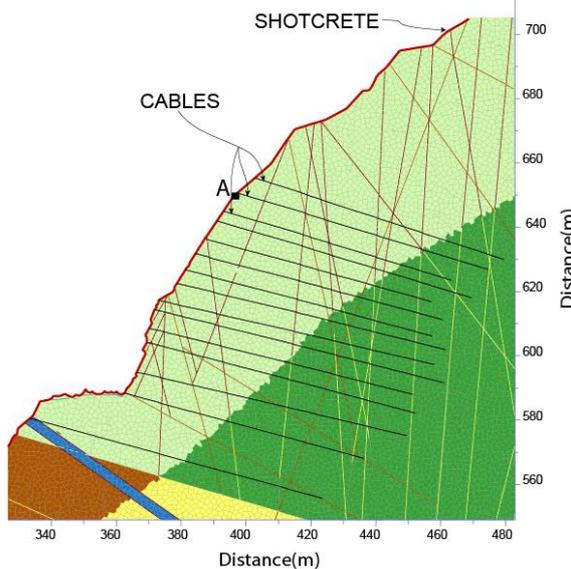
Suggested support system contains of 10 cm shotcrete layer and cables at an average distance of 8 m
